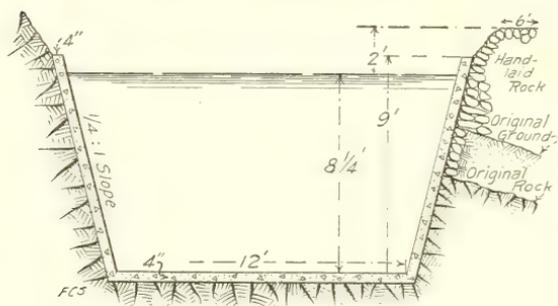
Section of concrete-lined canal in rock, Central Oregon Irrigation Co., Deschutes, Oreg.
